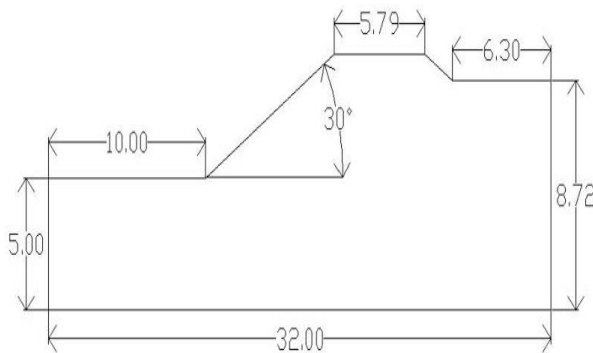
Geometric model of slope at Shahidminar location of Rajshahi city protection embankment, Bangladesh
